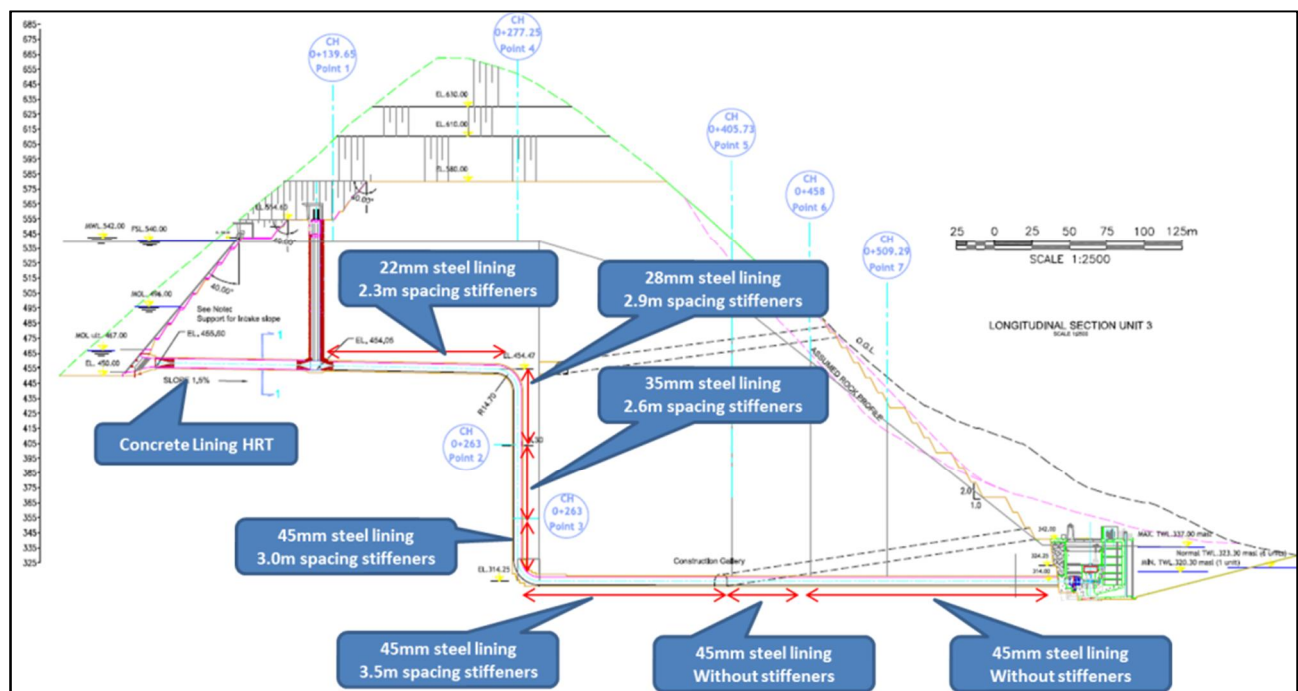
Summary of the steel liner and stiffeners dimension.
